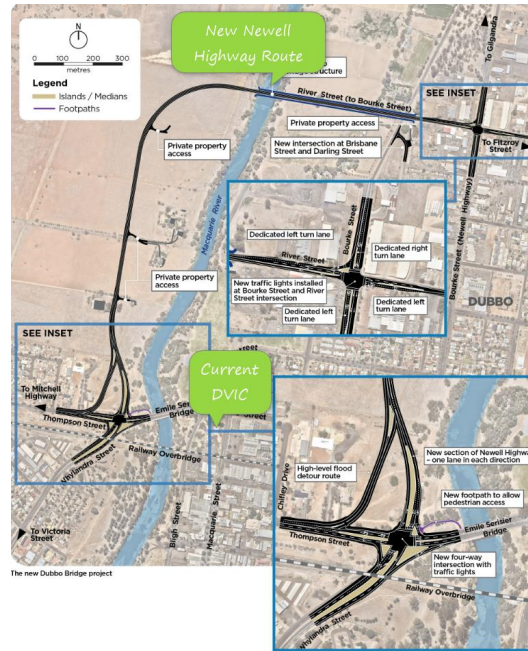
New Dubbo Bridge and Newell Highway diversion plan (supplied: Transport for NSW 2023)
